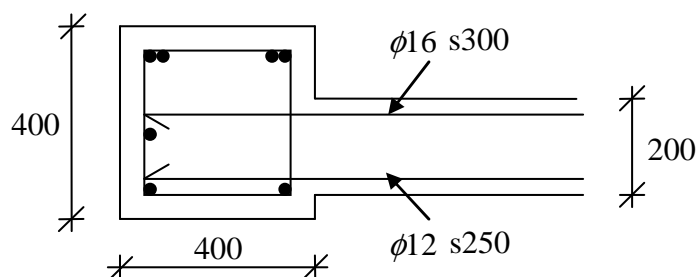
Sketch over a typical edge beam, based on Vägverket (2001).
